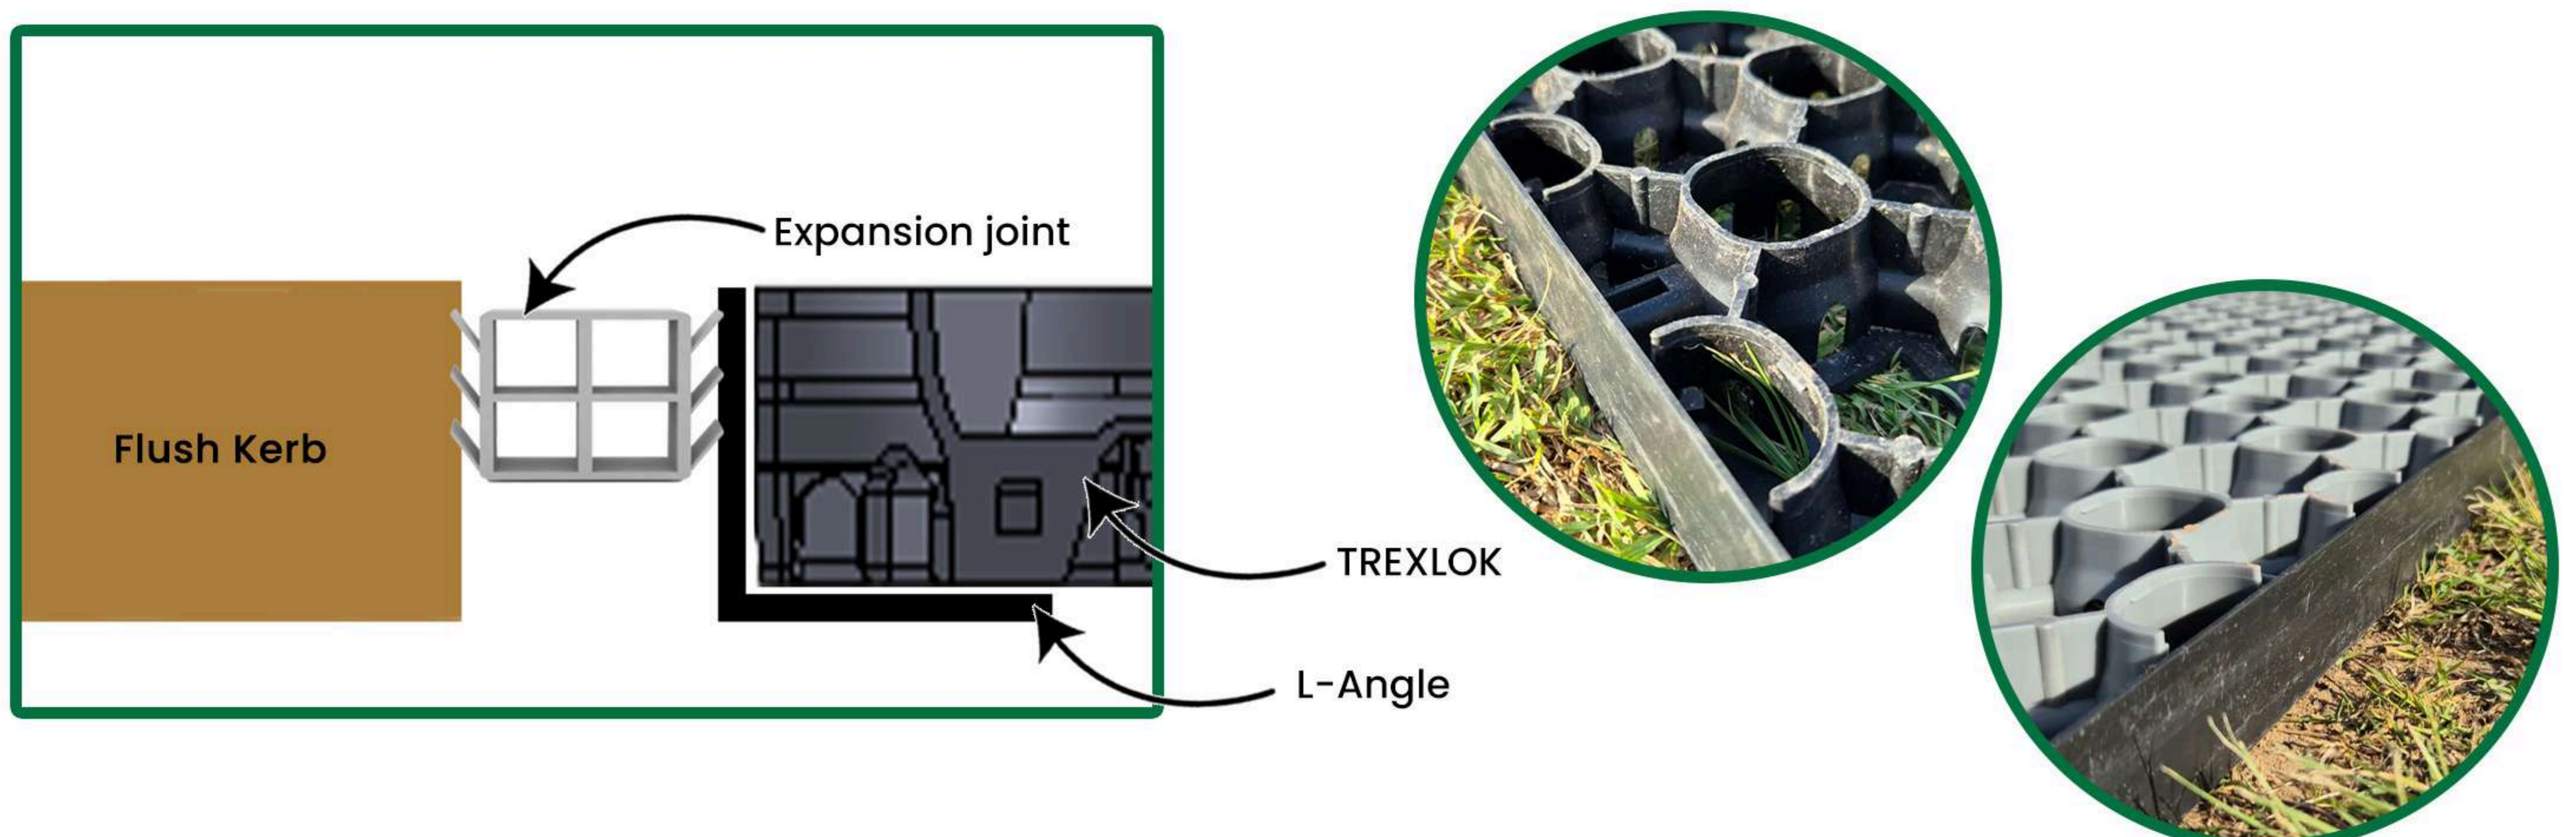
TREXLOK and expansion joint installation adjacent to Edge Thickening
